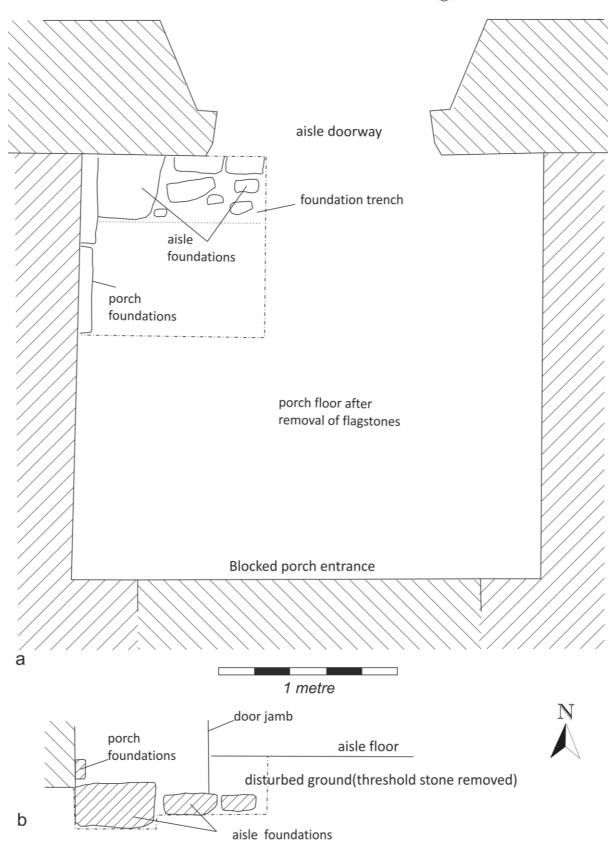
The south porch showing foundations of the south aisle and porch a) plan b) section.
